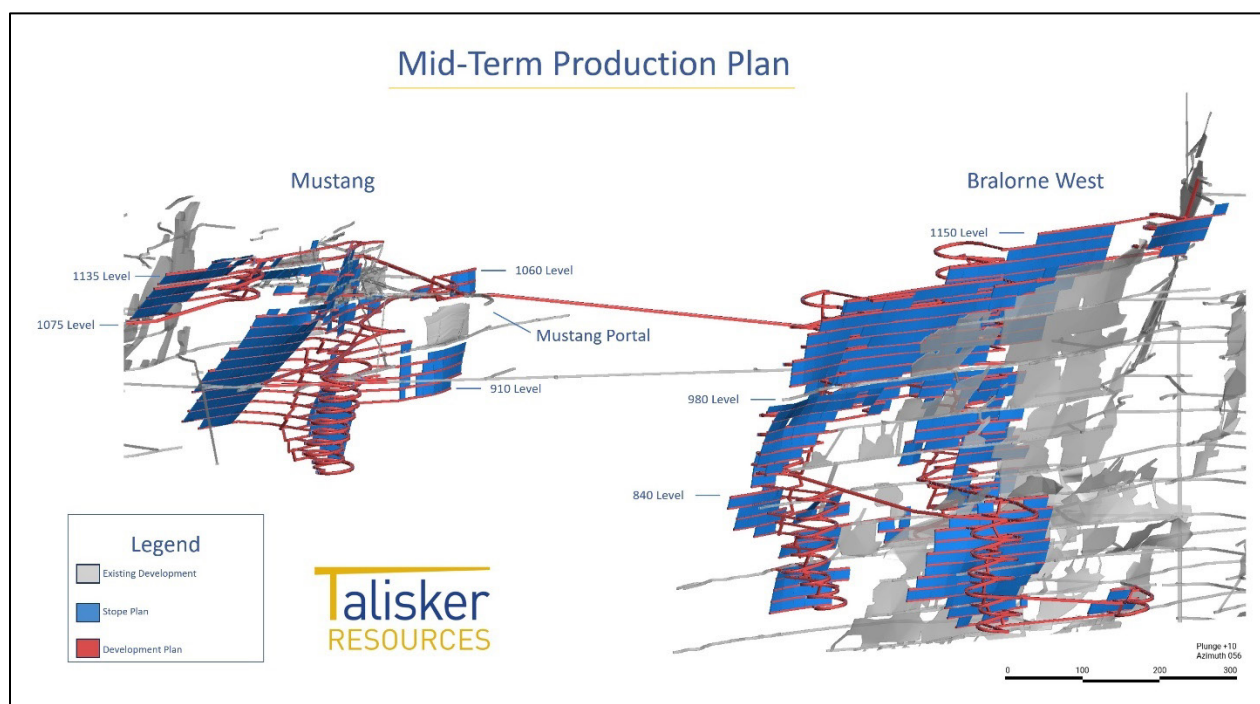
Plan view of Mustang Mine production plan 2025 through 2029.
